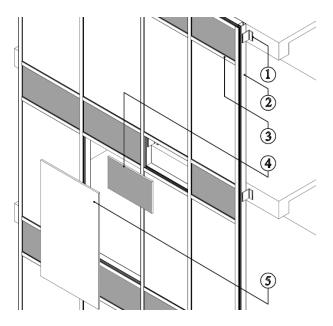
Stick curtain wall assembly. 1. Anchor, 2. Vertical mullion, 3. Horizontal mullion, 4. Spandrel Panel, 5. Glass Lite. Adapted from Kawneer 1600 Wall System 1, Kawneer Inc. (2014).
